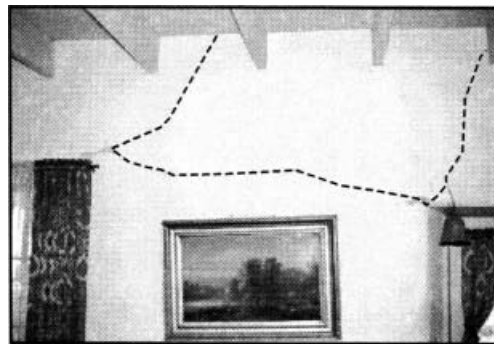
Minor cracking on the north wall of the living room (dotted line along cracks).
